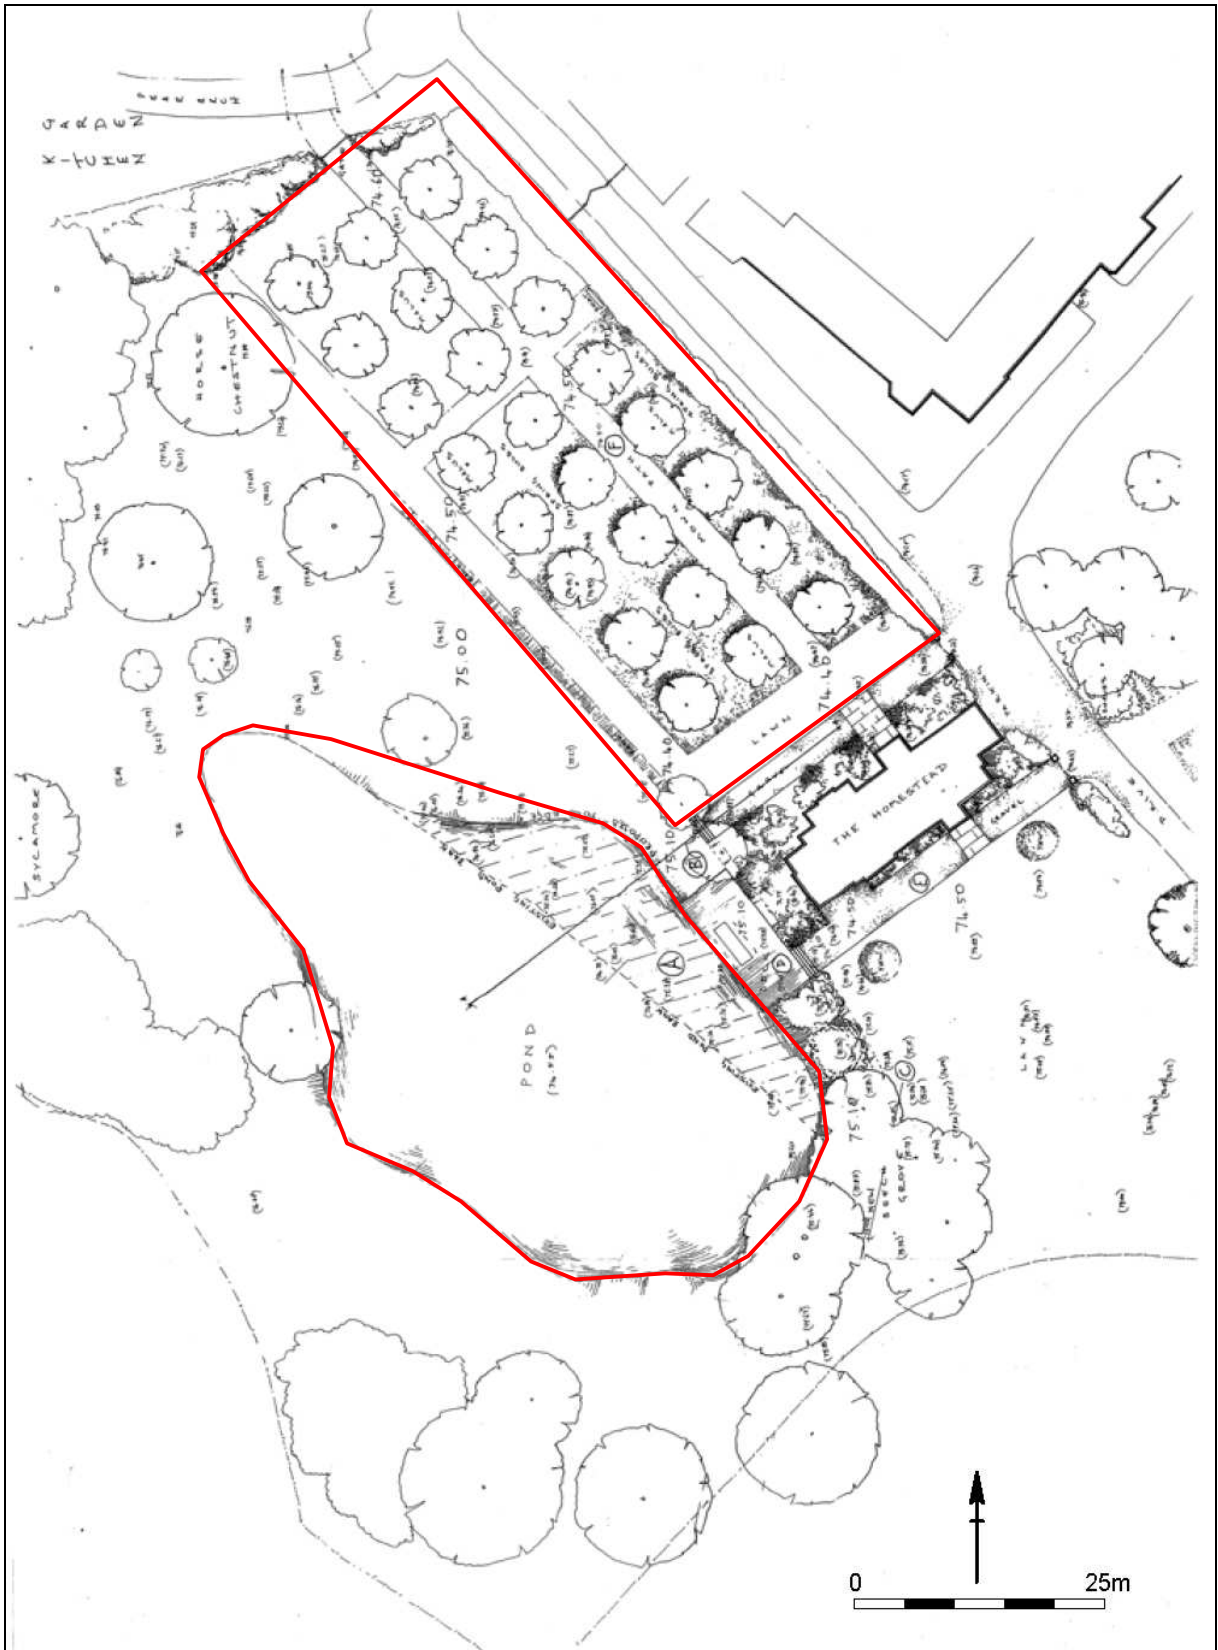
Development, new pond and orchard outlined in red (scale 1:750)
